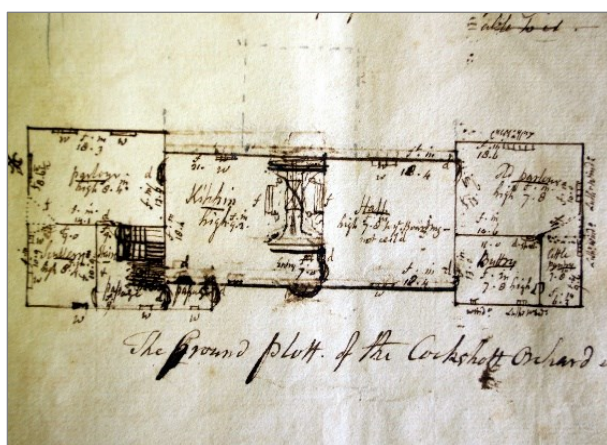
Cockshoots layout from John Moulding's notebook (held by Worcestershire Archives ref. 009:1 BA2636/52)
